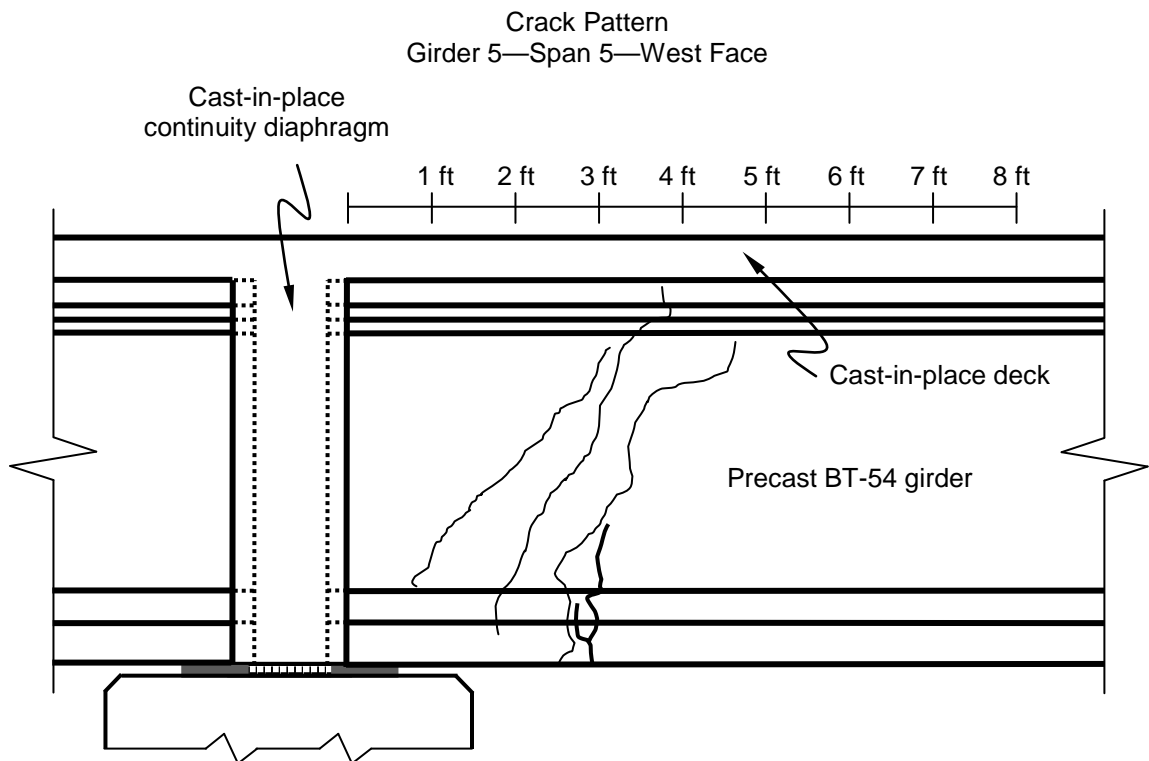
Cracking pattern in end region of precast girder (Barnes et al. 2006)
